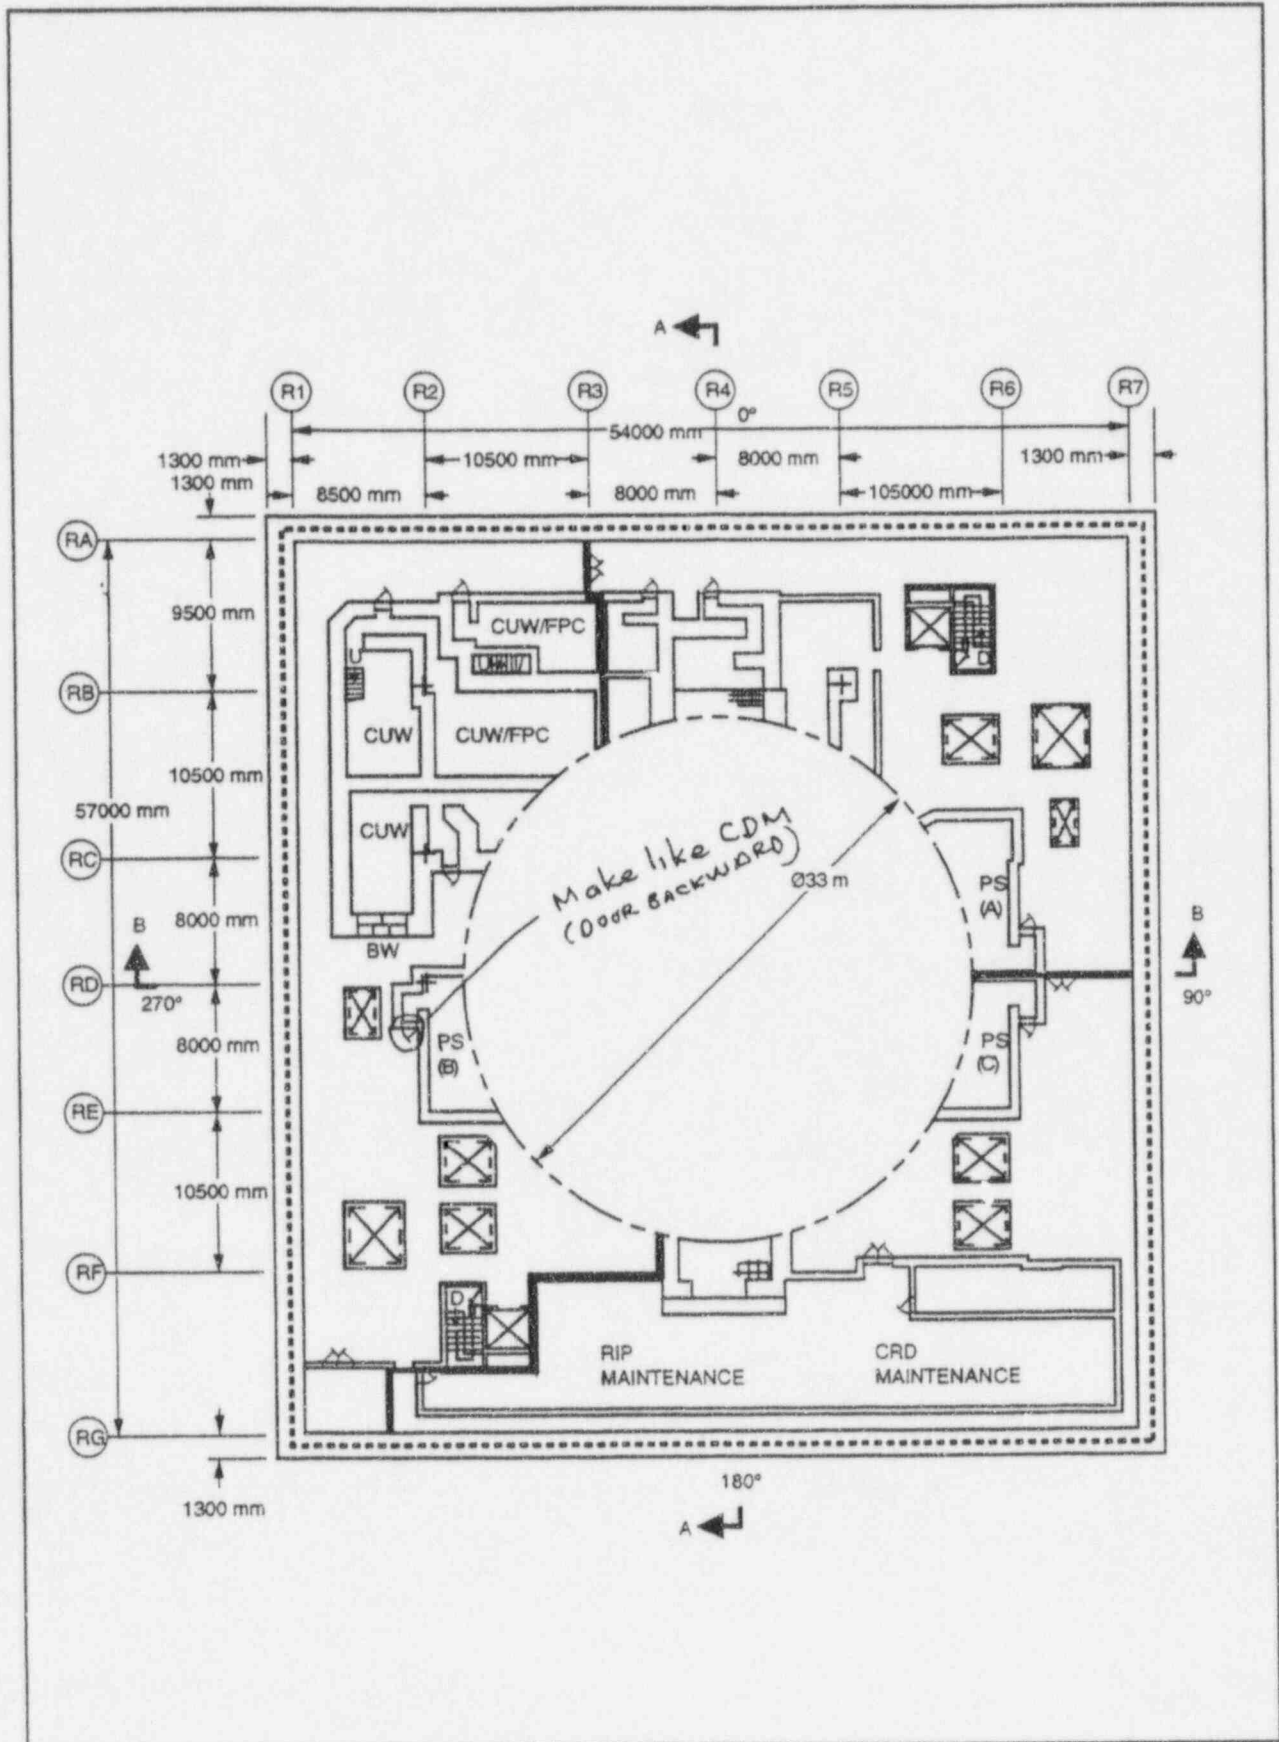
Reactor Building Arrangement, Floor B2F—Elevation -1700 mm
